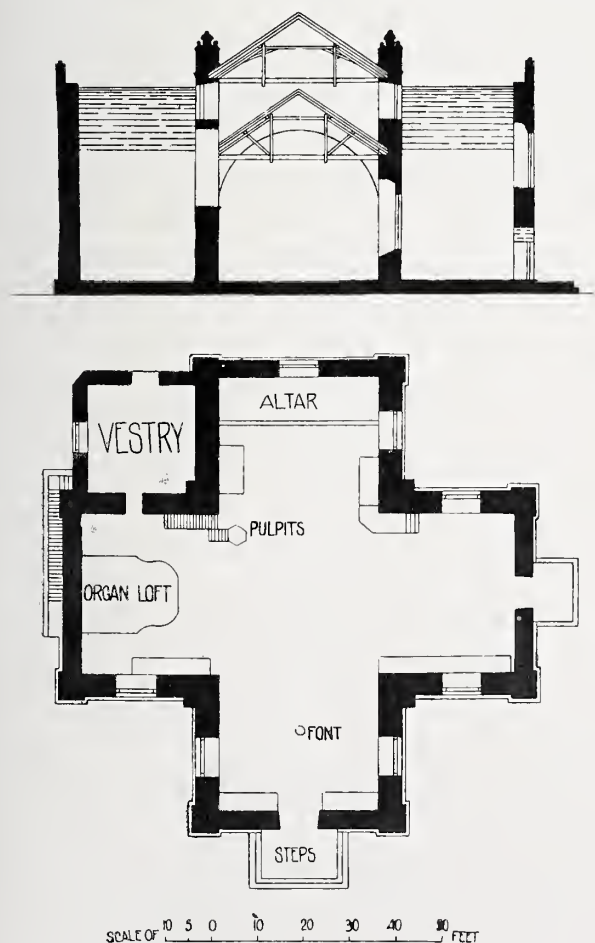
PLAN AND SECTION OF JAFFNA CHURCH.
